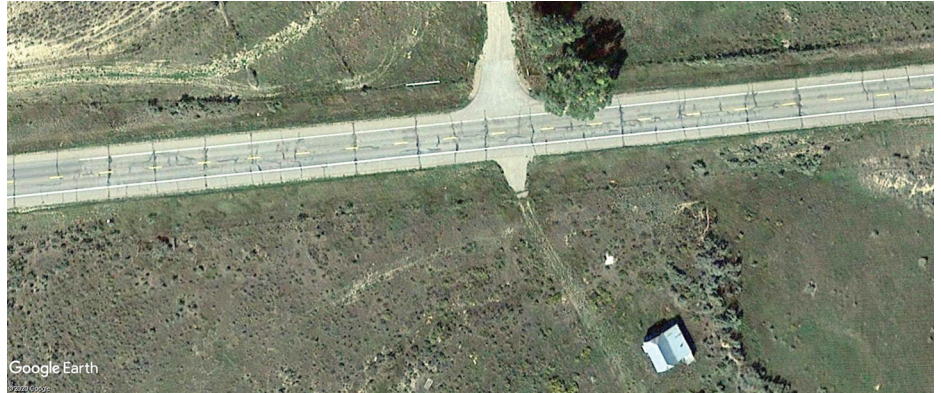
Existing asphalt pavement condition prior to concrete overlay
